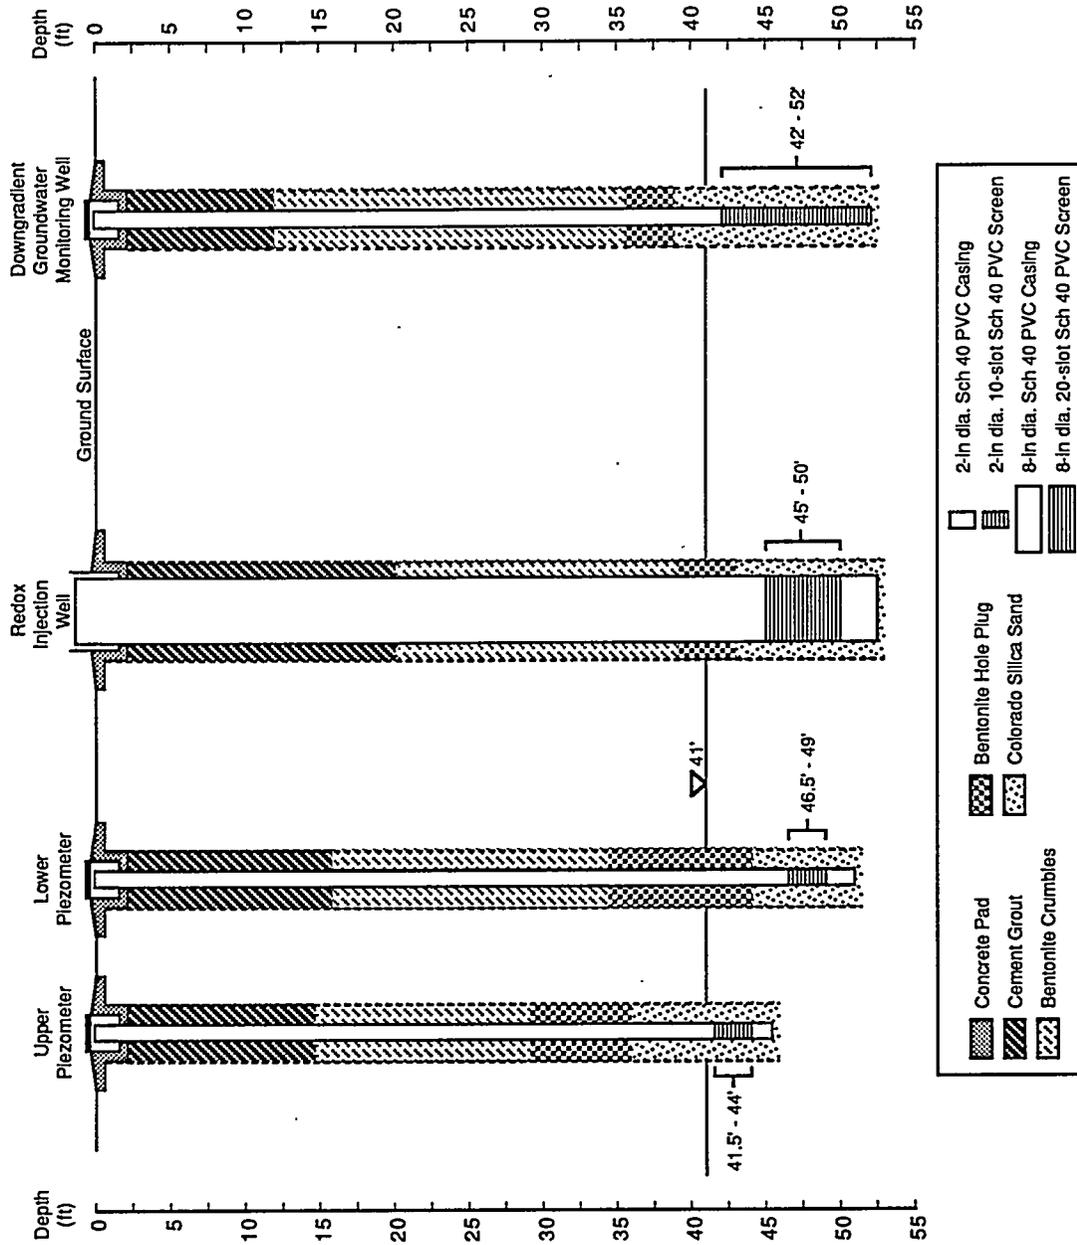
Schematic Well Construction Diagram for Wells Installed at the ISSRM Site
